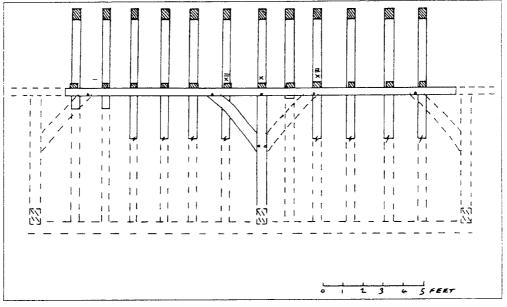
A medieval roof in Head Street, Colchester - Long section from Rear
